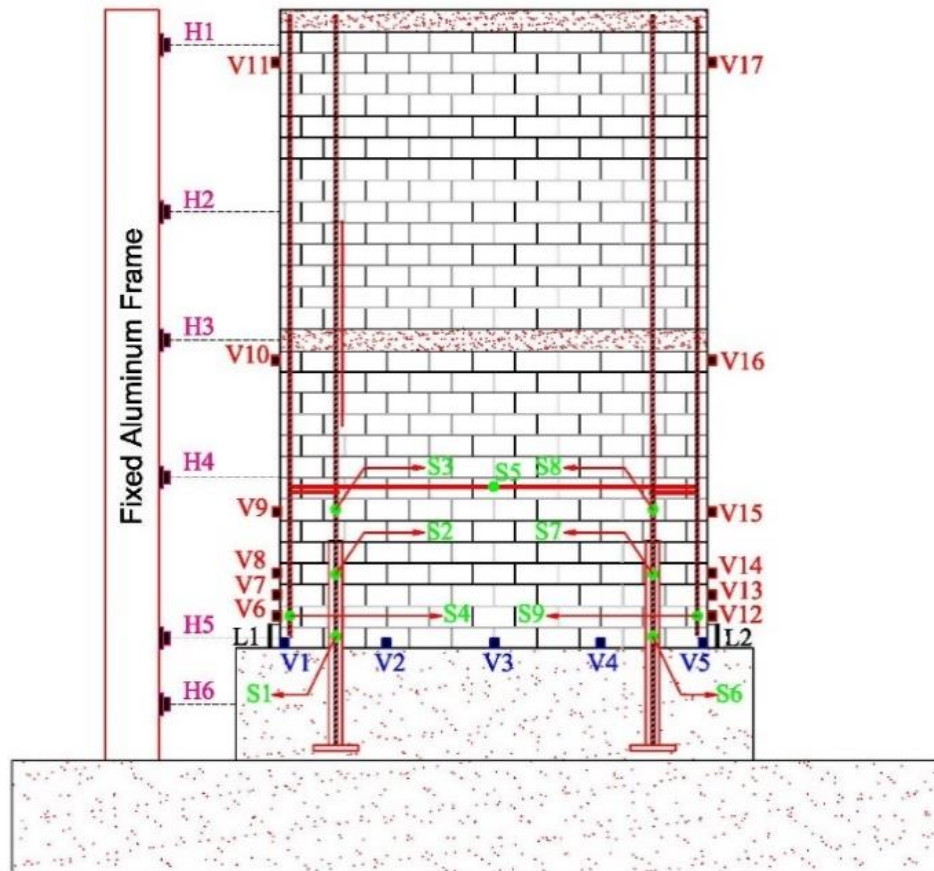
Typical wall instrumentation (all dimensions are in mm)
